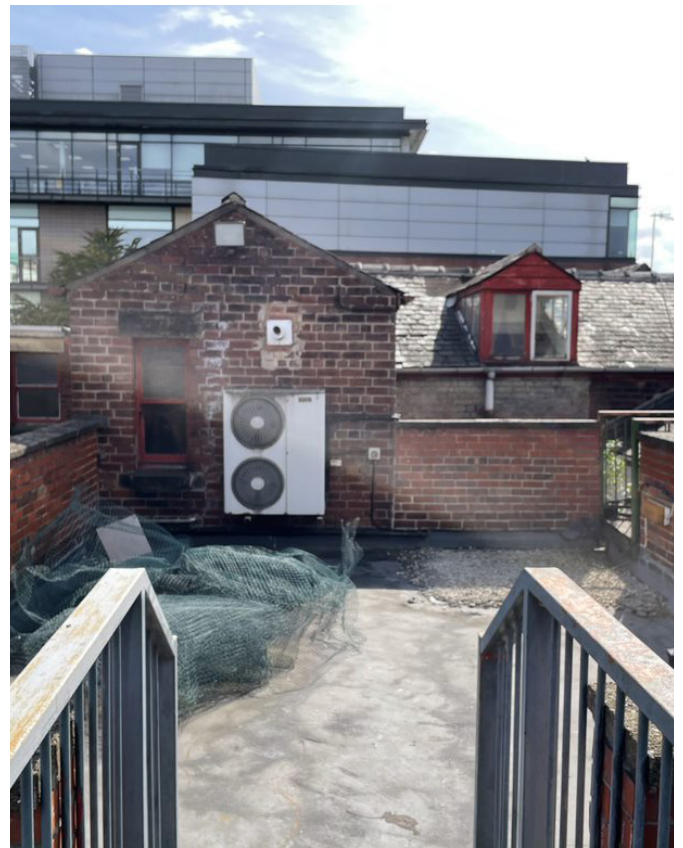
Proposed Intervention Area 3: Sky Deck Garden (Source: Authors) Fig 25. Proposed intervention 3: Sky Deck Garden (Source: Authors)
